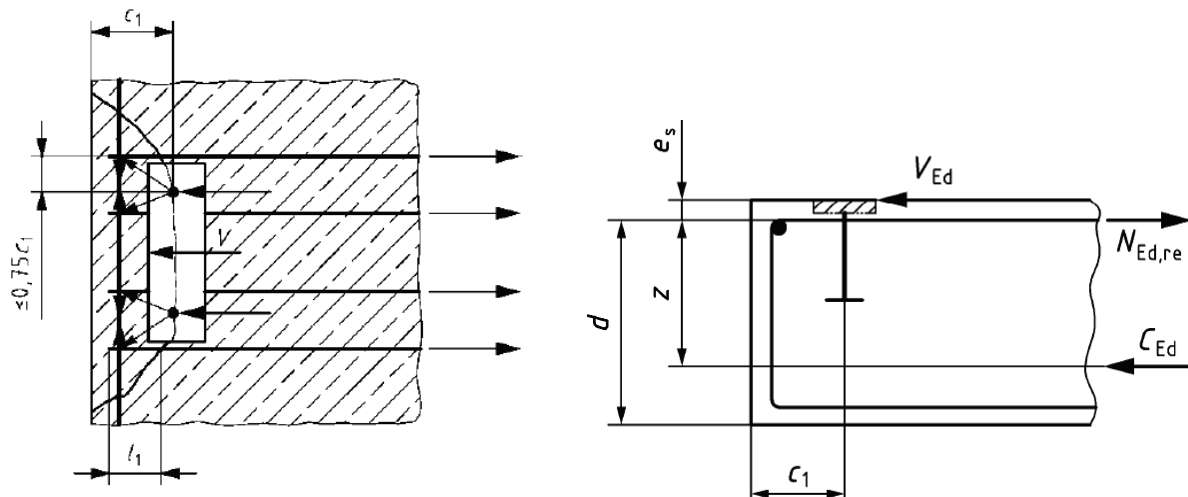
Simplified strut-and-tie model for anchor reinforcement by EN1992-4 (2014)
